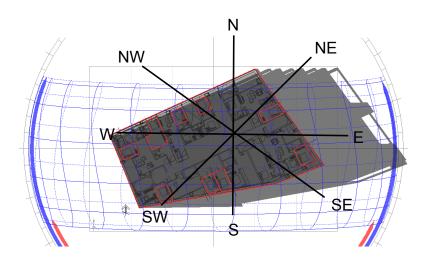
a Typical floor plan Solar penetration on 21 December
